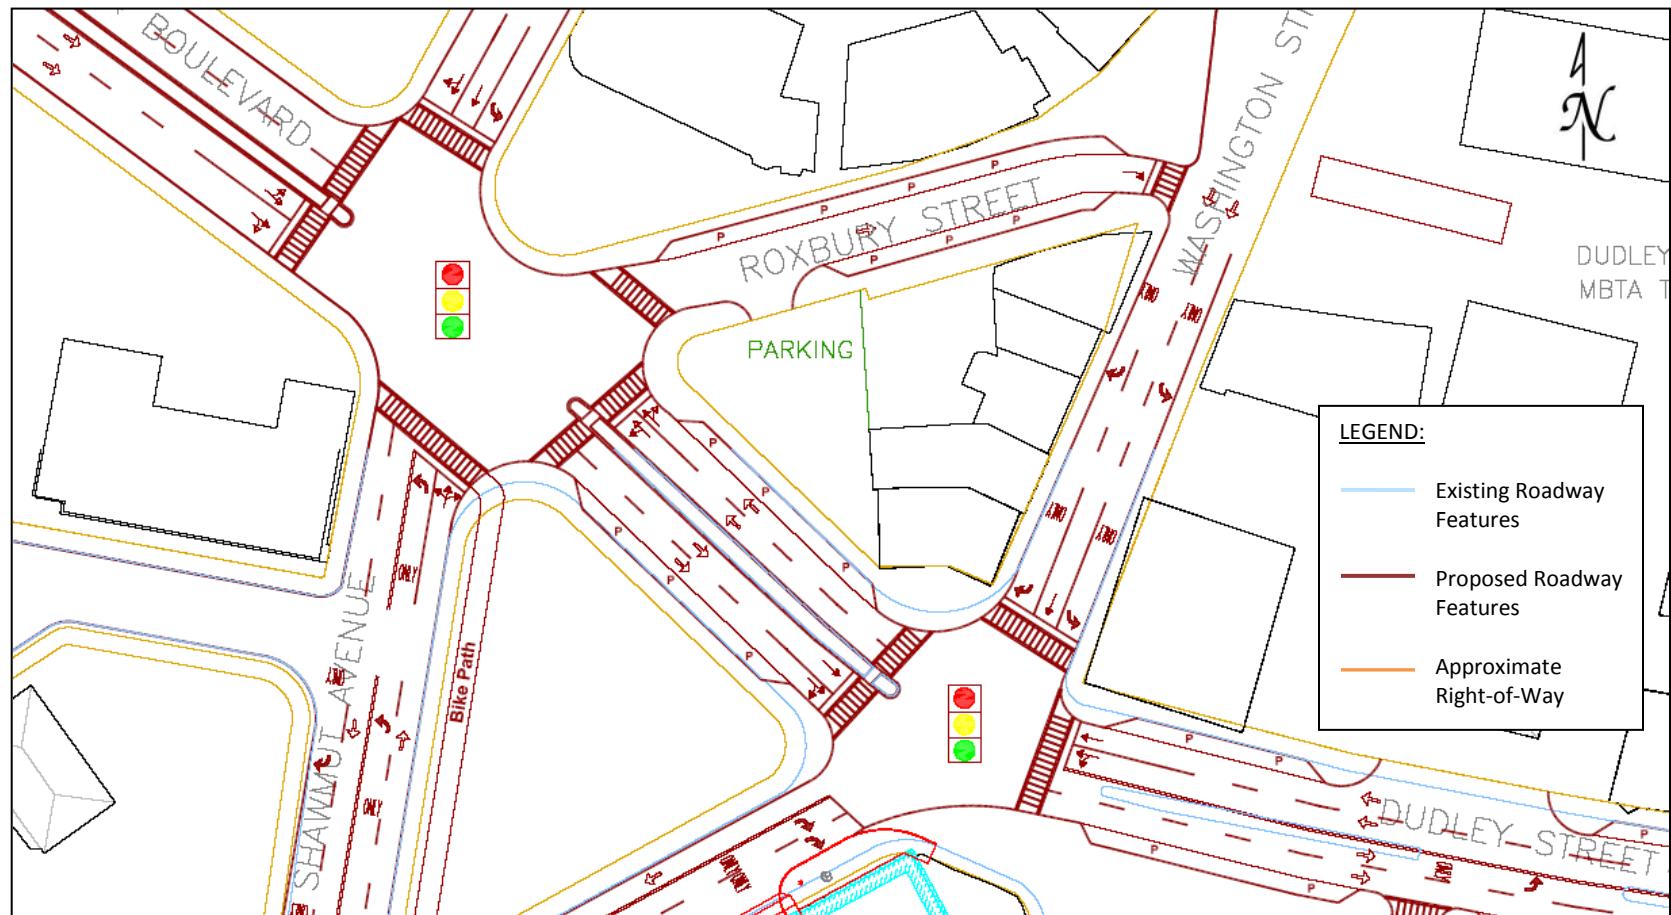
Dudley Street at Washington Street and Shawmut Avenue
